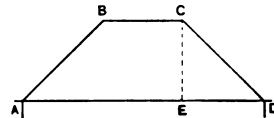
Side Elevation of Roof shown in Fig. 21.
